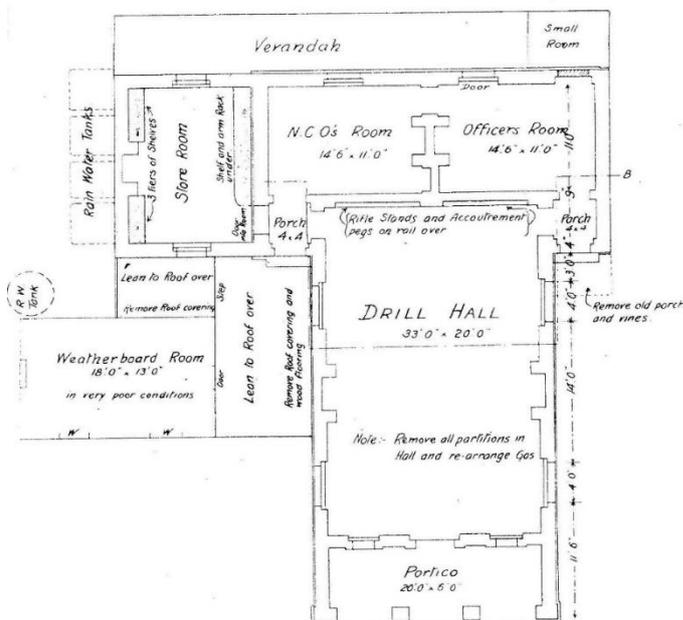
1905 Plan showing existing fixtures and alterations to be made for the changeover to Drill Hall. Note - reference to "Remove lean to roof over and wood flooring"
